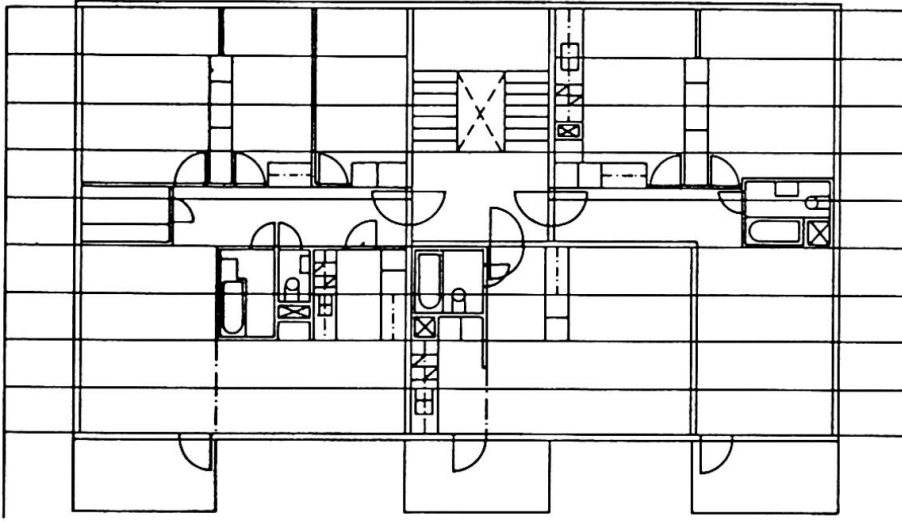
Horizontal plane of the apartment building on the Finnish BES-element system
